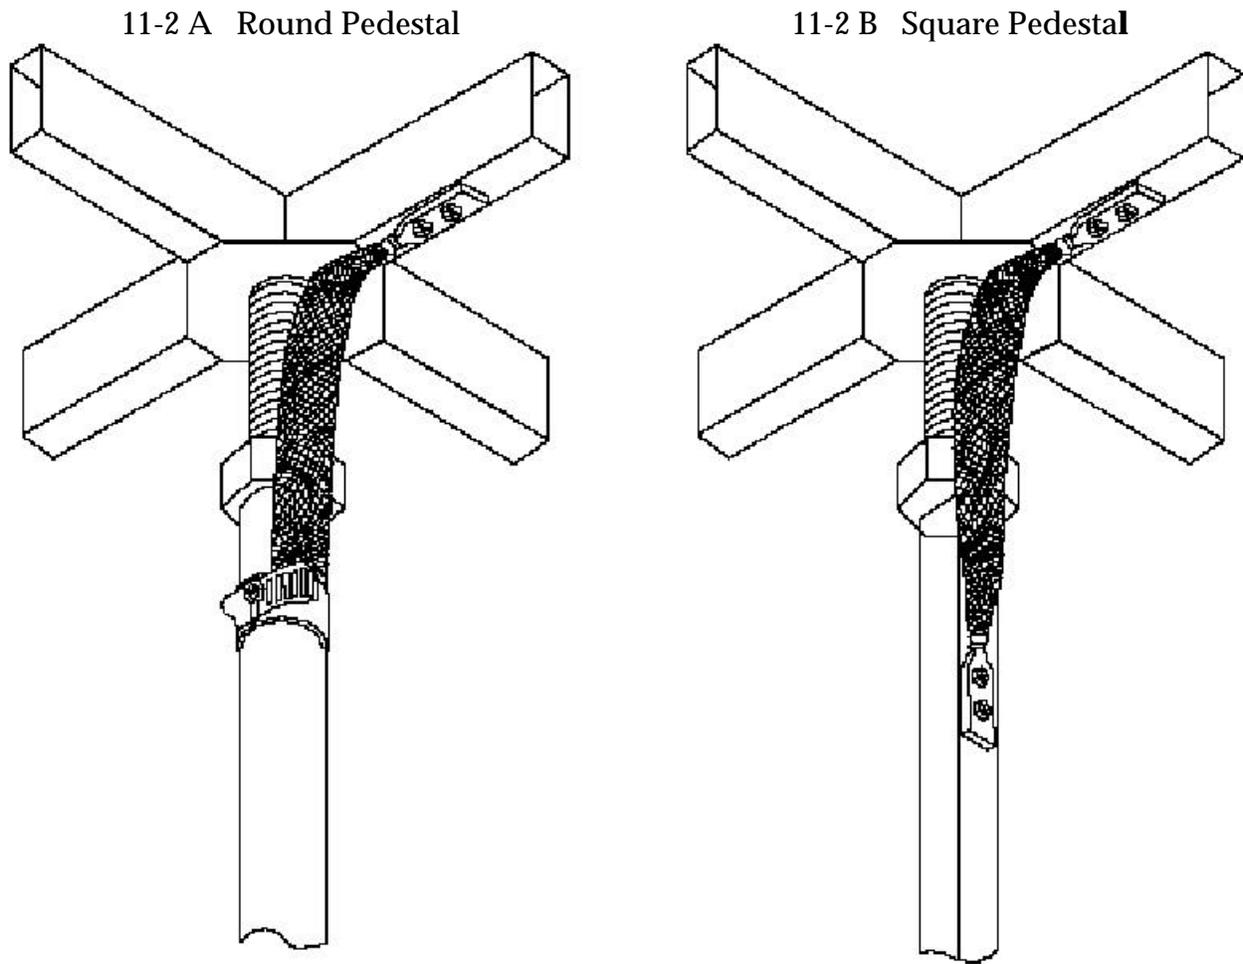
Bolted Stringer Raised Floor to Pedestal Connection
